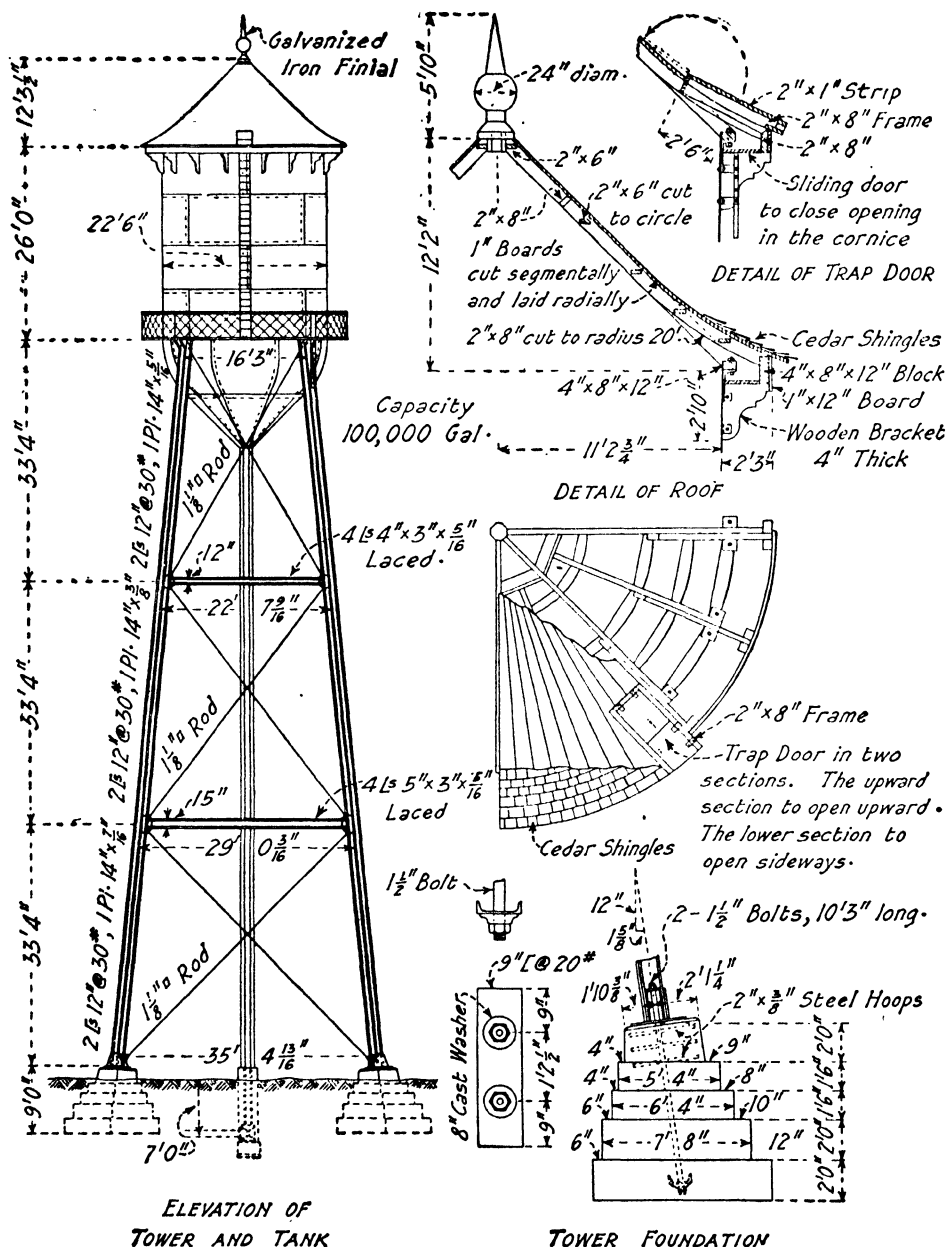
ELEVATED TANK AND TOWER, JACKSON, MINN.
